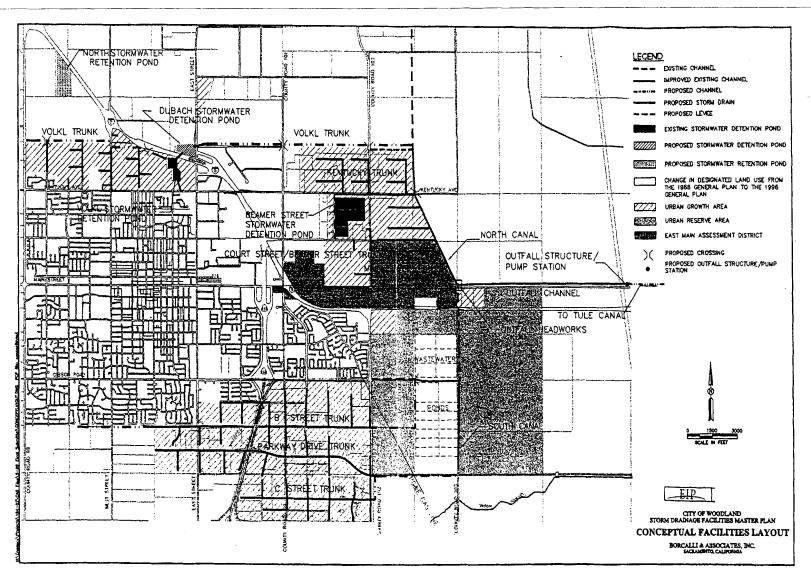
City of Woodland Storm Drainage Conceptual Facilities Layout
